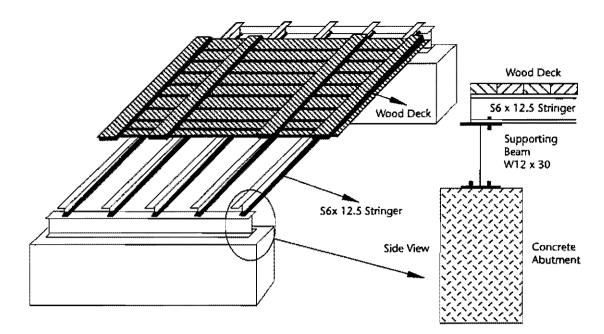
Typical plan of a short-span steel bridge with wooden deck.
